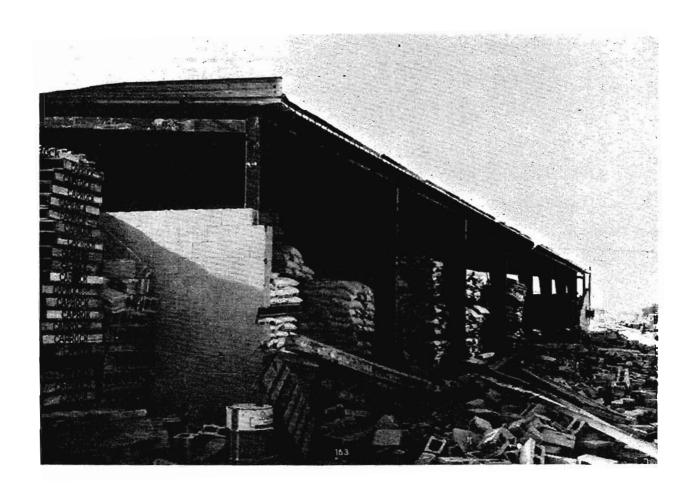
MASONRY FILL-IN WALL FAILURE. Concrete block walls filled space between steel frames.
